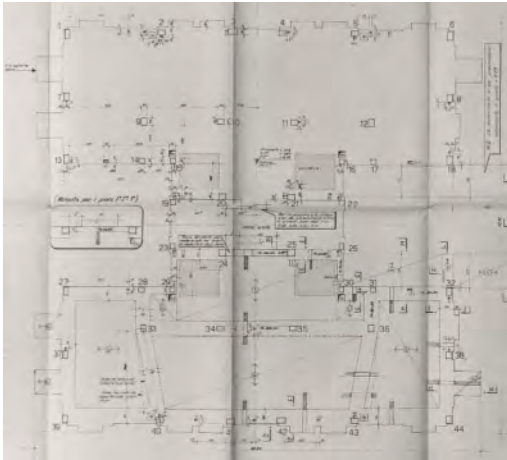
Bottom structural floor plan (detail 1:50) adopted in blocks B2 by Borini (ATC, 14563).
